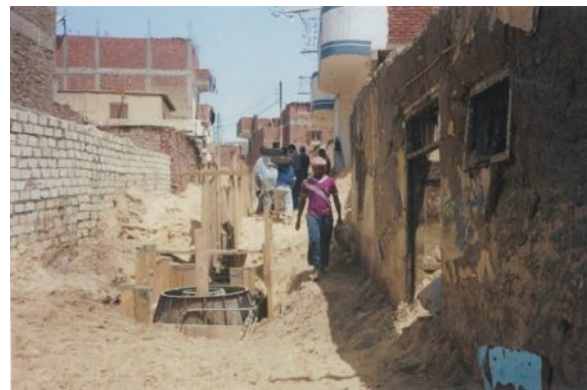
Installing Pipes for Sewage Network in Narrow Streets
